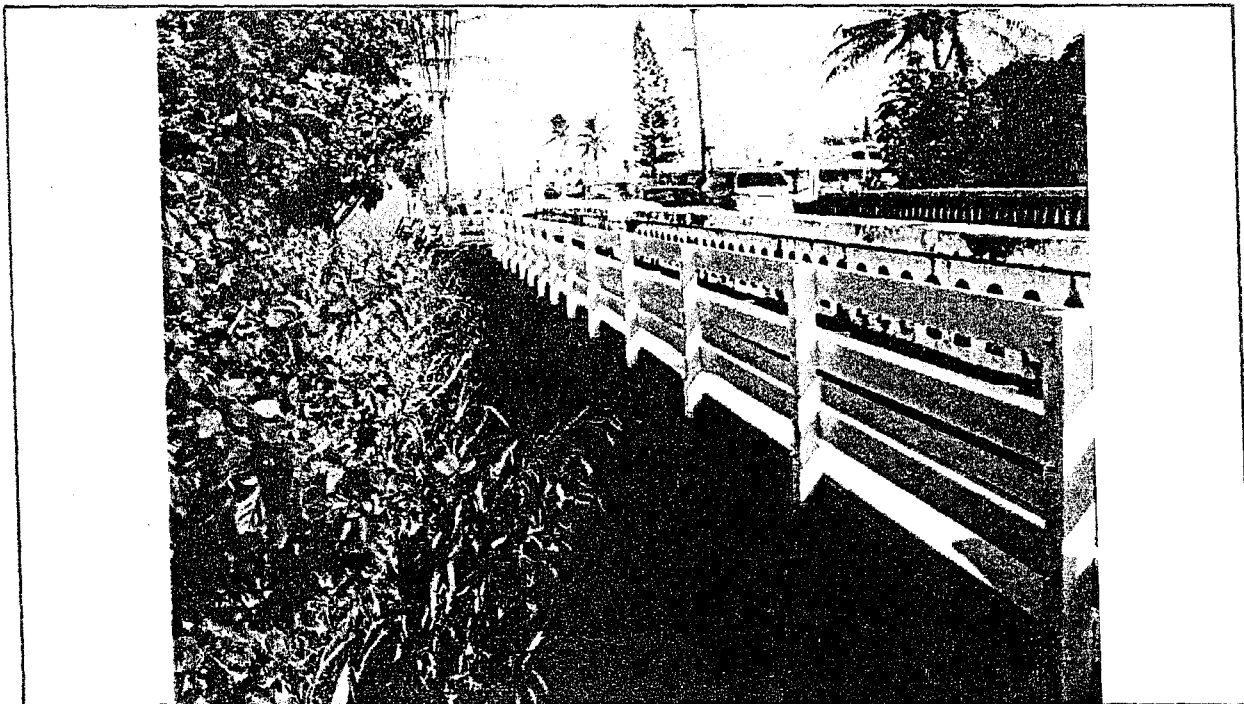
Photo of Kaipapa`u Bridge and Accompanying Pedestrian Walkway, Taken to North.
